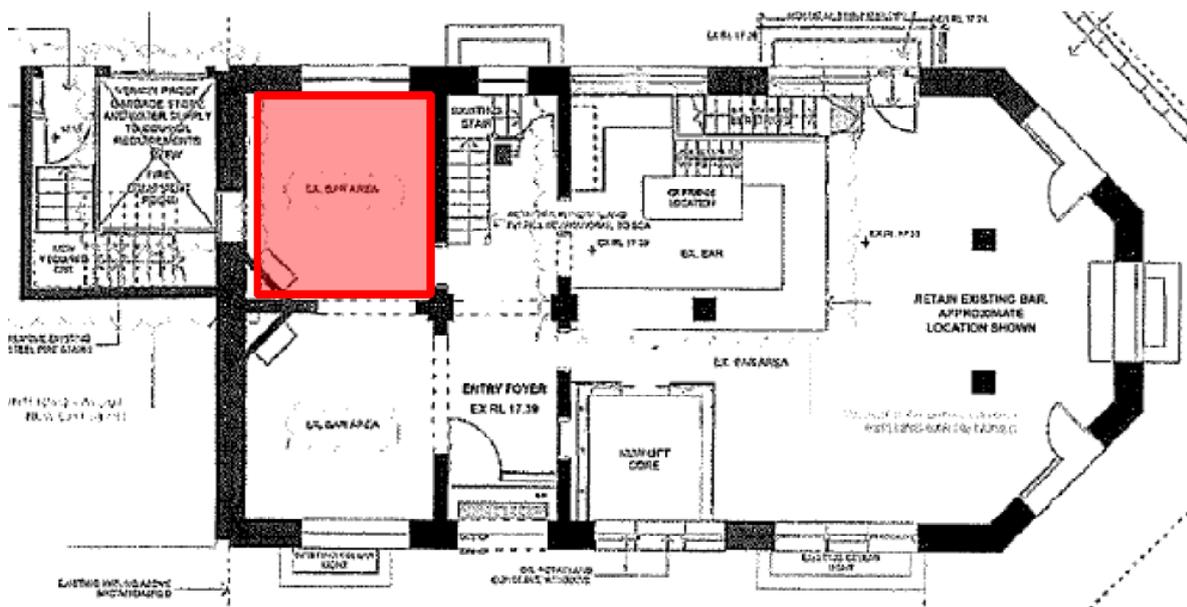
Tables and chairs to be stored in the ground floor parlour area (marked in red)
